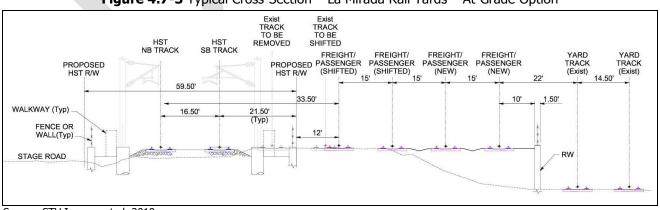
Typical Cross-Section – La Mirada Rail Yards – At-Grade Option
